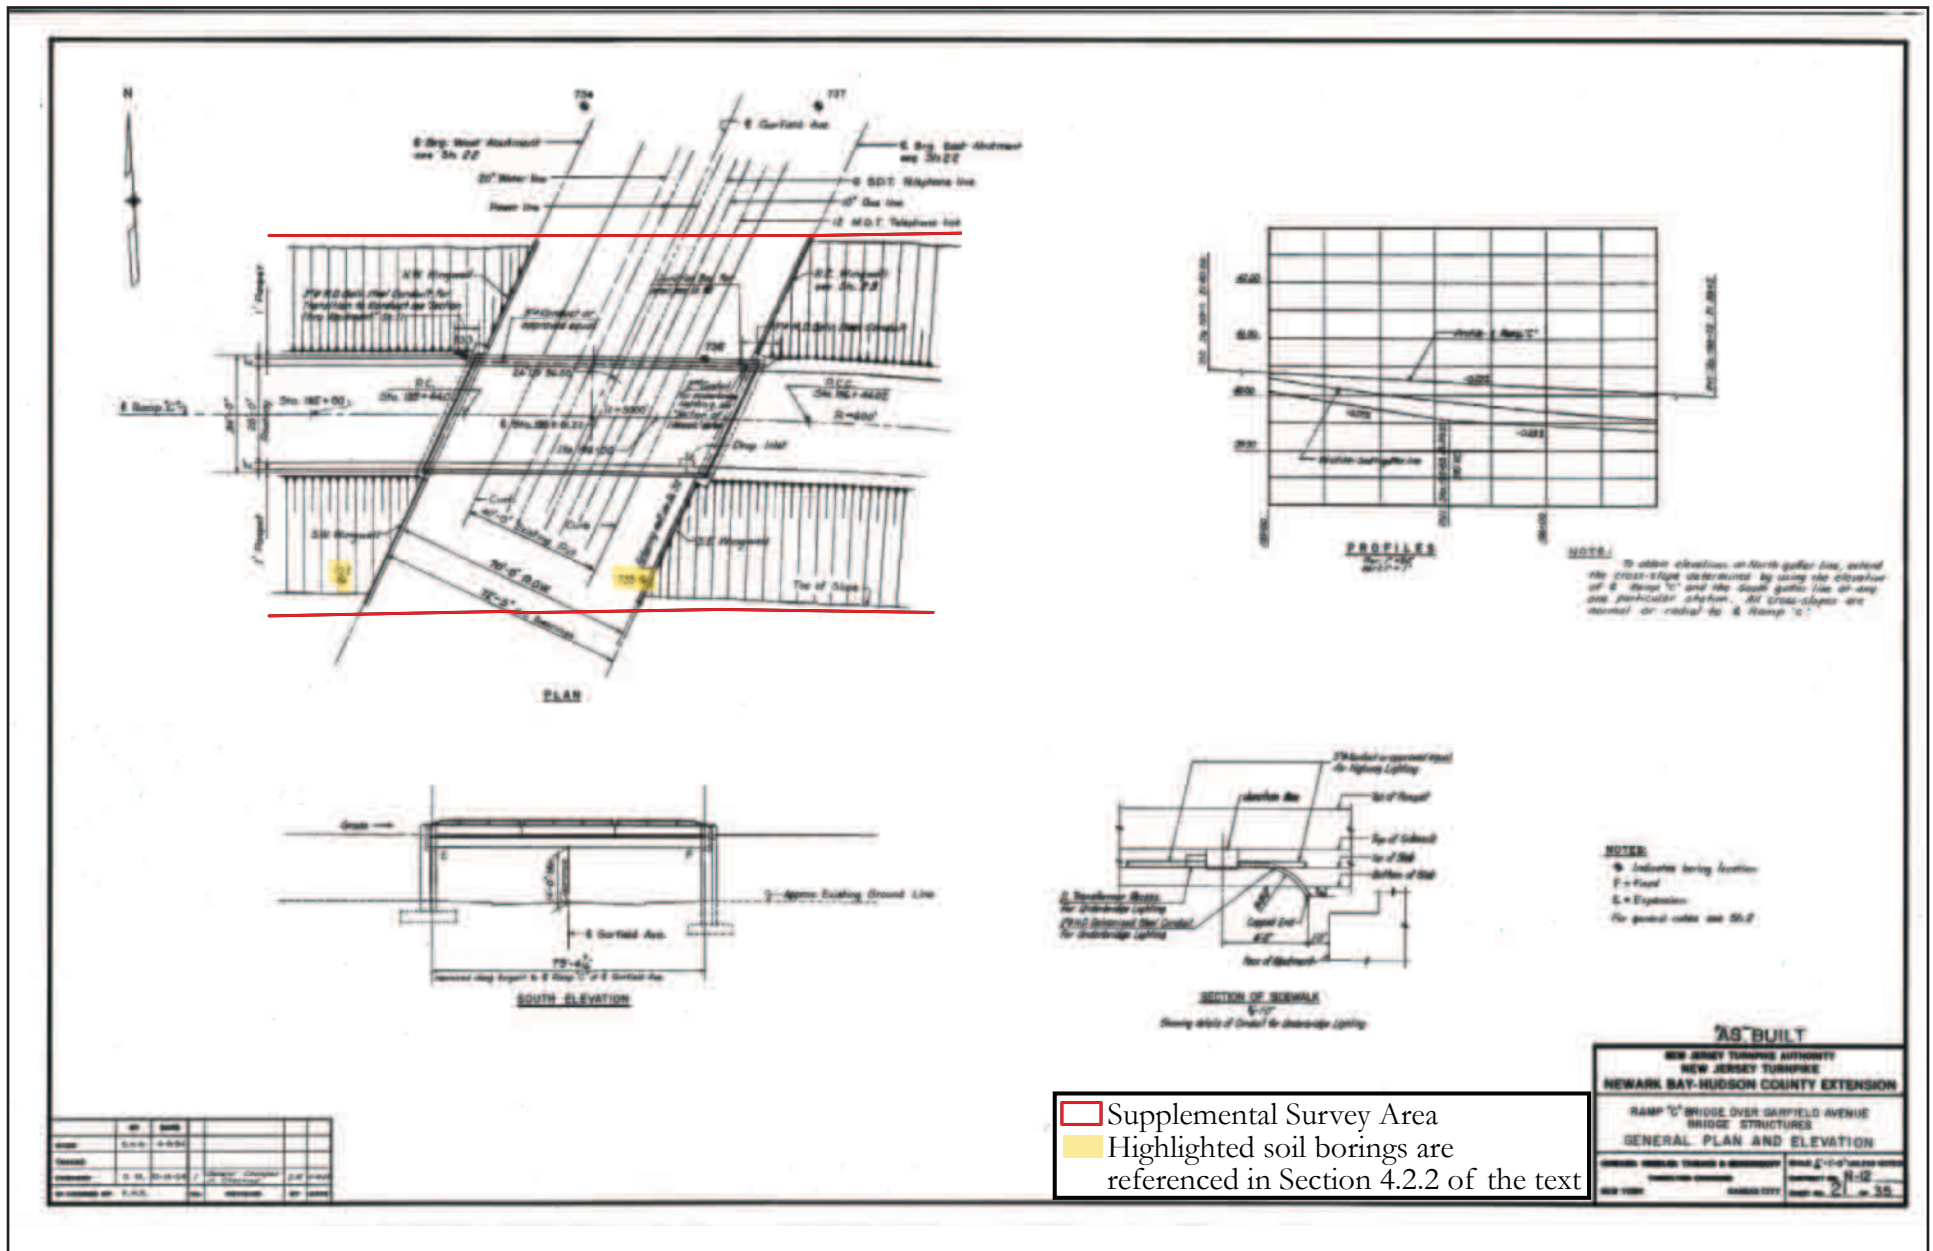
Ramp C Overpass Bridge Structures, General Plan and Elevation, showing soil boring locations (Howard, Needles, Tammen and Bergendoff 1954b).
